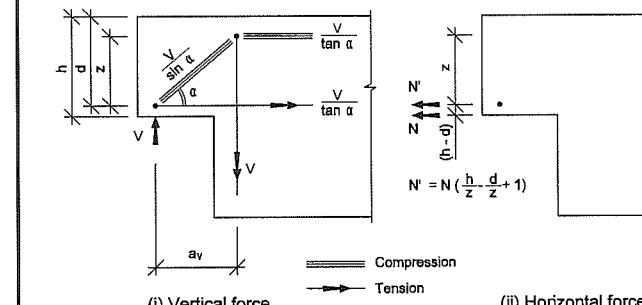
Reinforcement And Force Resisting System In Beam Half Joint
